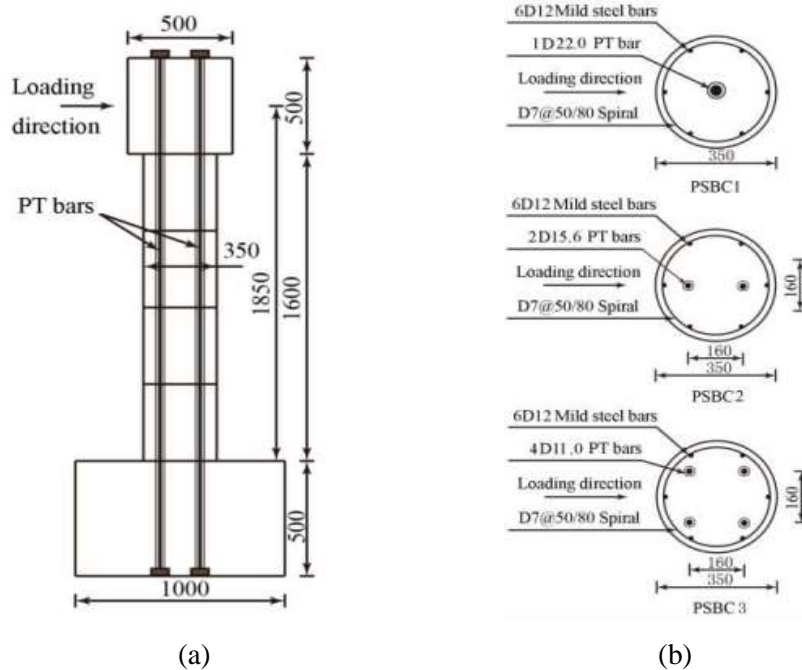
Columns with different PTs arrangements: (a) elevation layout, and (b) cross section (units: mm).
